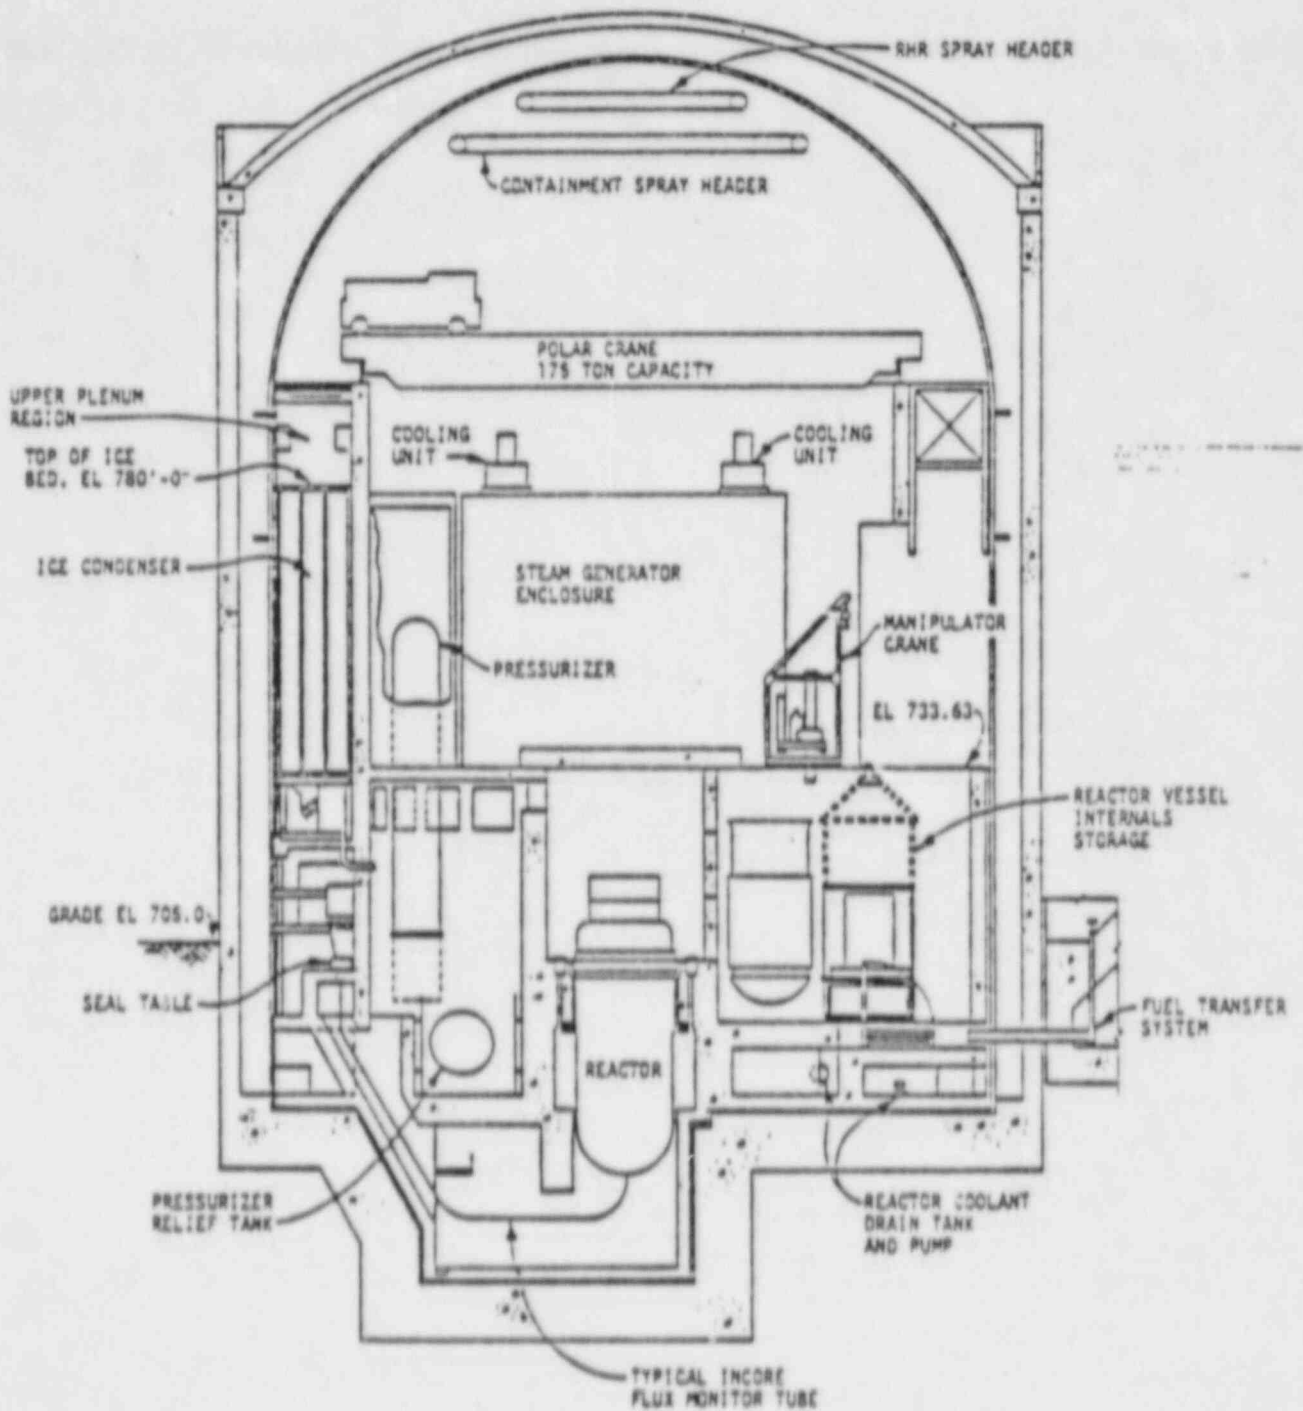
CONTAINMENT CROSS SECTION
